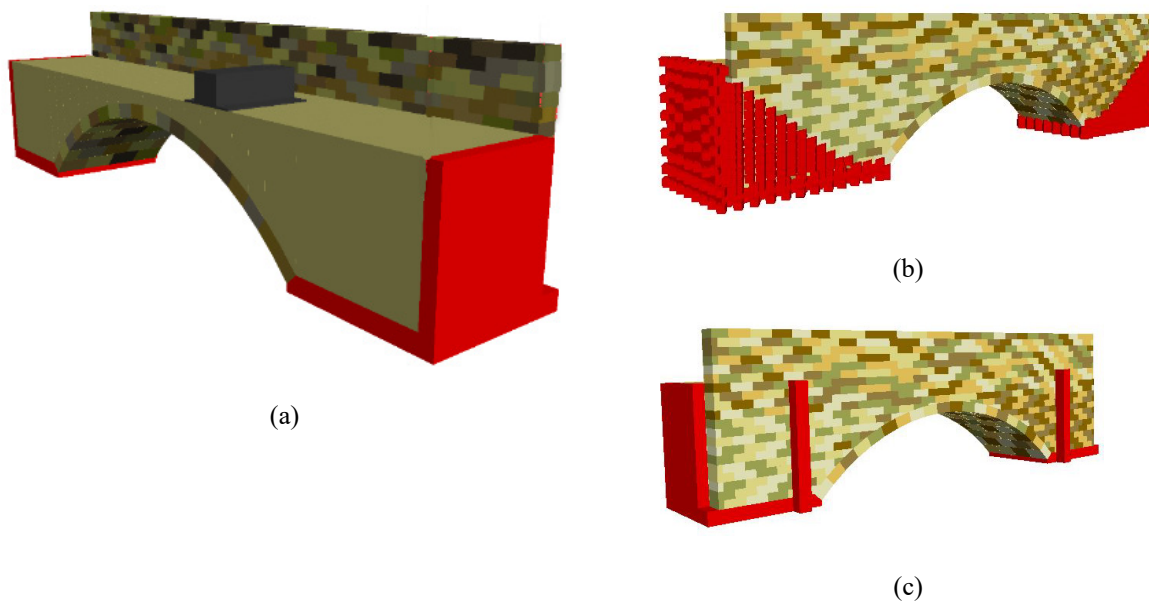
Geometry of the masonry arch bridge: (a) loading element at quarter span, wing walls parallel (b) and perpendicular (c) to the abutments.
